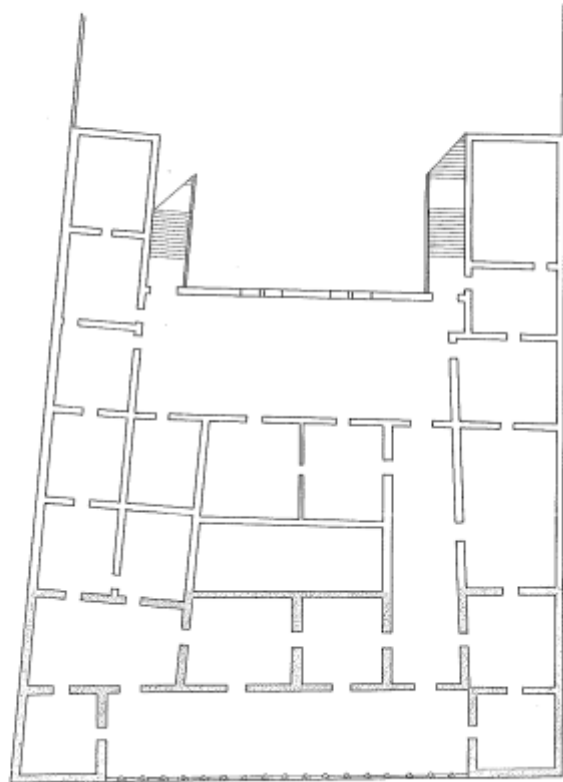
6 Juergen Schulz, *Reconstructions of the floor plans of the Fondaco dei Turchi (New palaces)
